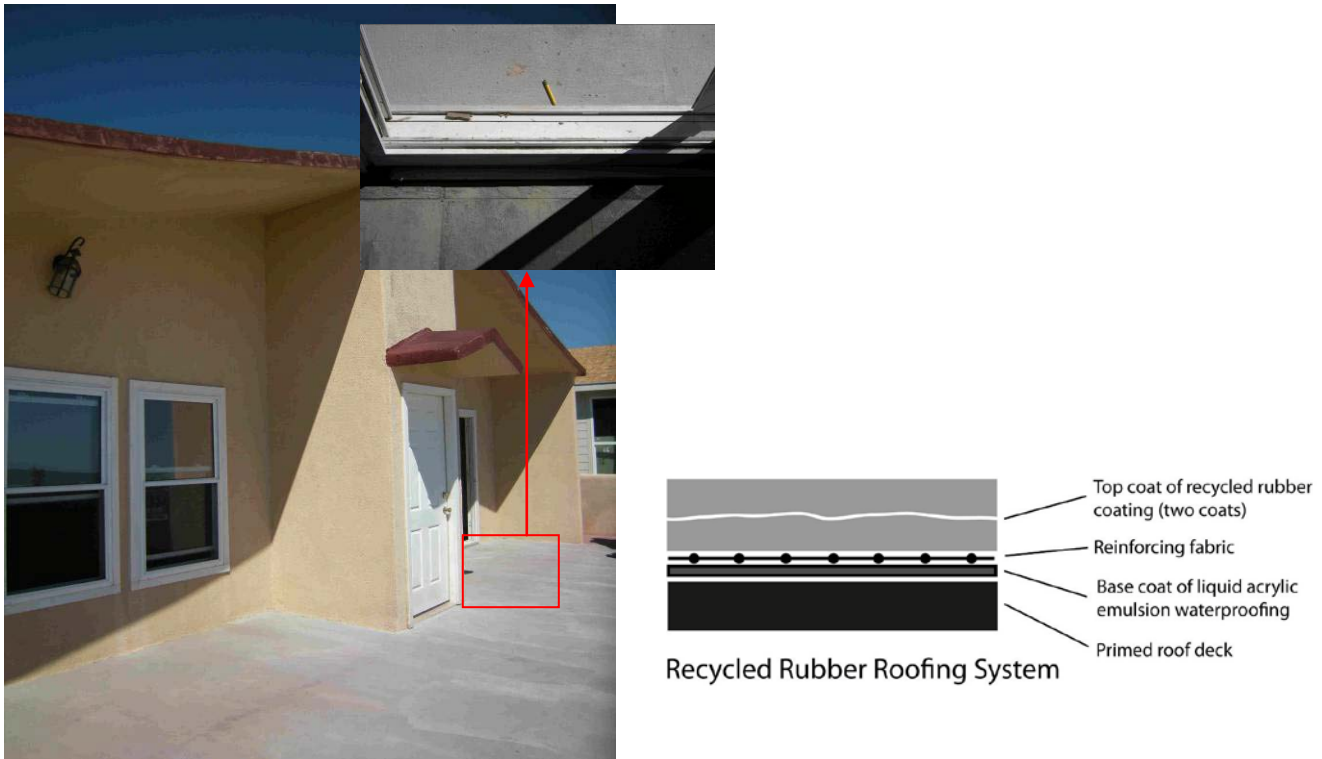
Recycled rubber tire elastomeric membrane on second floor walk-about deck, door pediment, and main roof. Inset shows close up of roof. 10/18/09 on (101808d, 3741)
